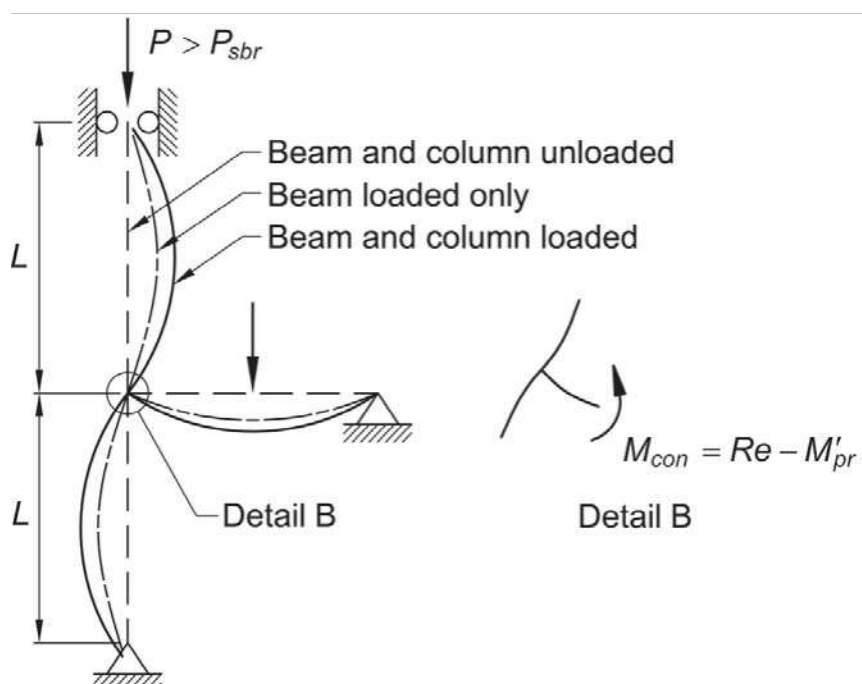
Illustration of beam, column and connection behavior under loading of beam and column.
